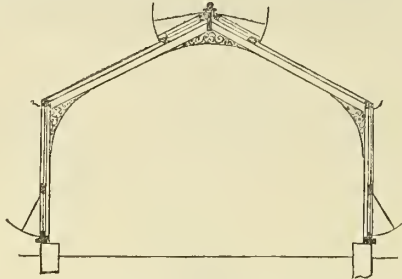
SPAN-ROOF WITH HIGH GLASS SIDES.
